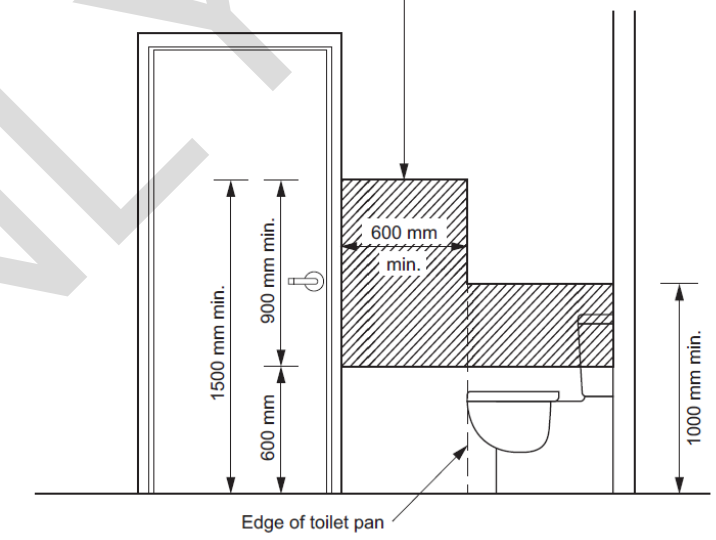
Location of noggings for a wall behind a toilet pan
